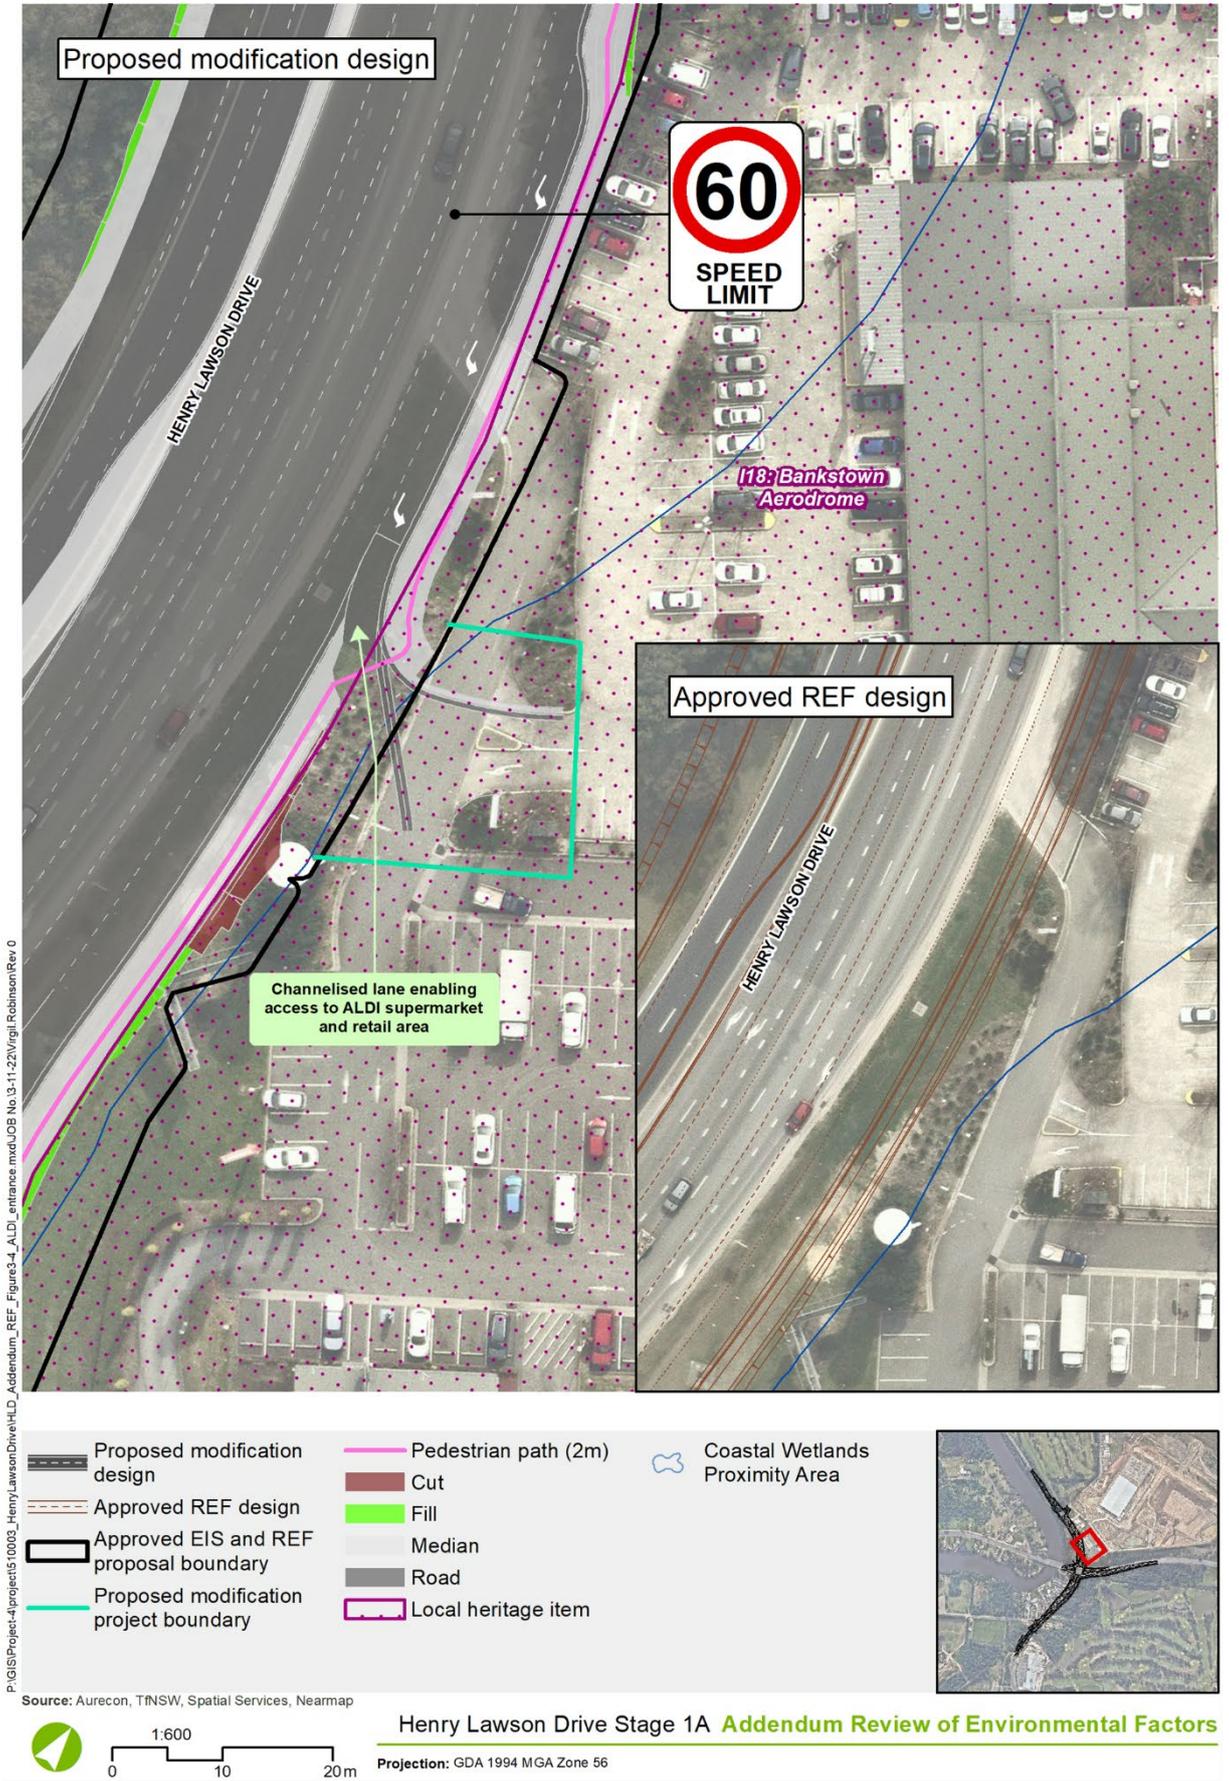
The proposed modification to the ALDI supermarket and retail area access
